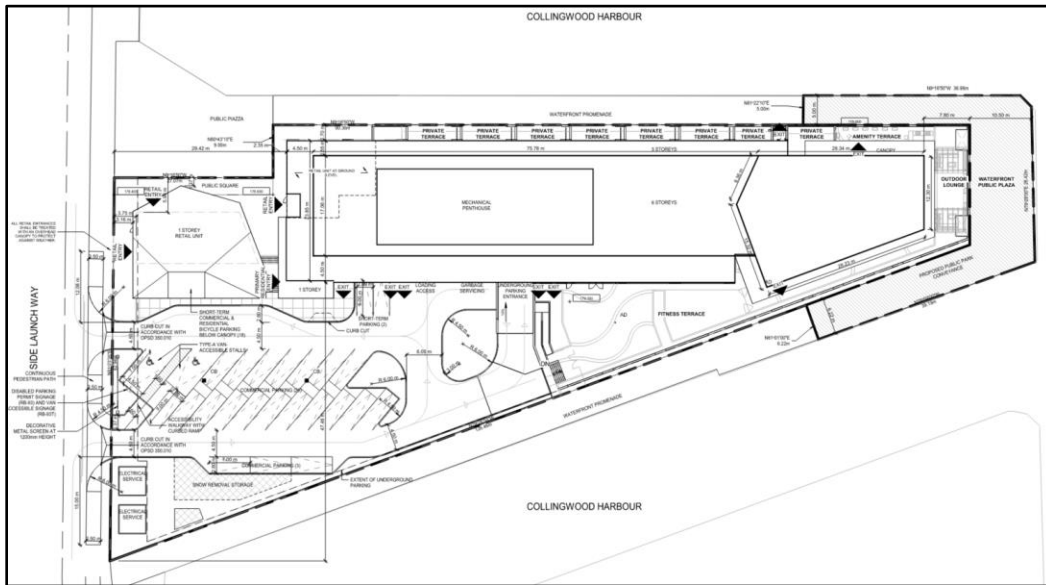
Excerpt of Site Plan showing the proposed building (north at right)
